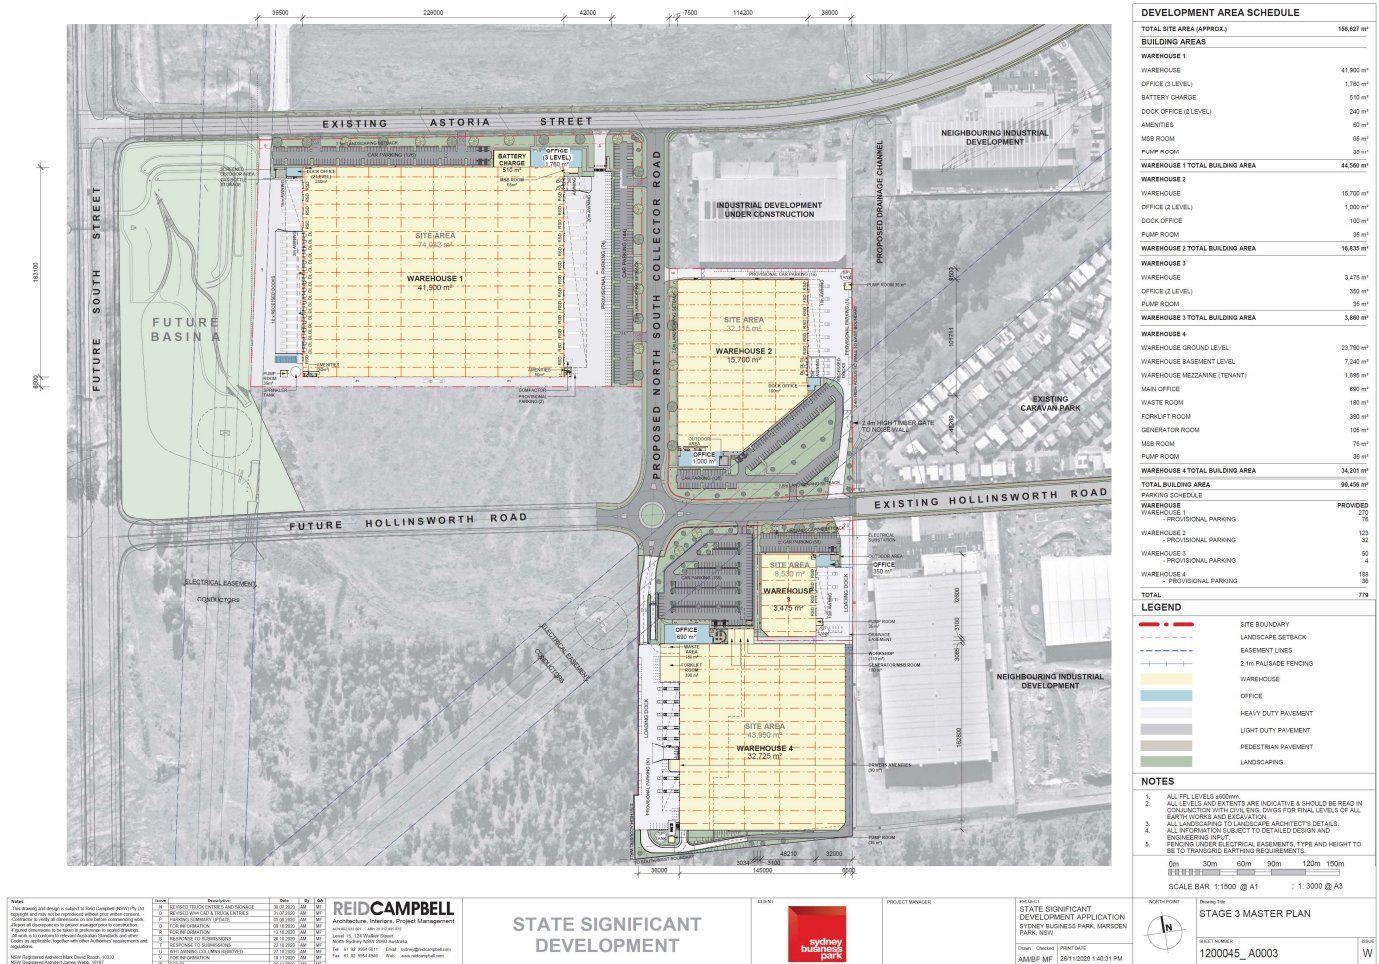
Stage 3 Master Plan (Source: Reid Campbell)
